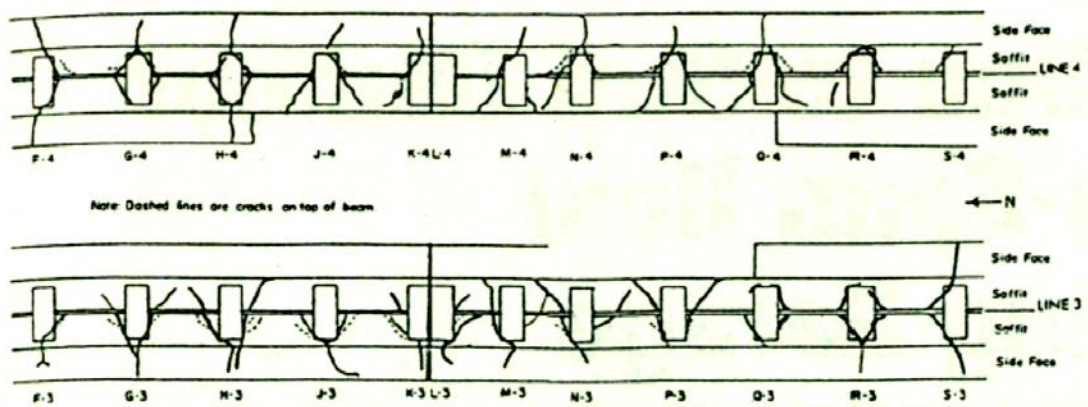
Cracks on faces of sloped split beams on lines 3 and 4 of level 8-9 (not to scale).
